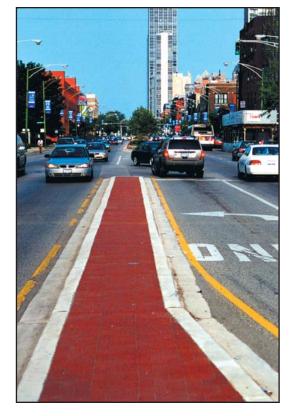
The bright white curbs are eye catching, and like pavement markings, help direct traffic. (70158)
